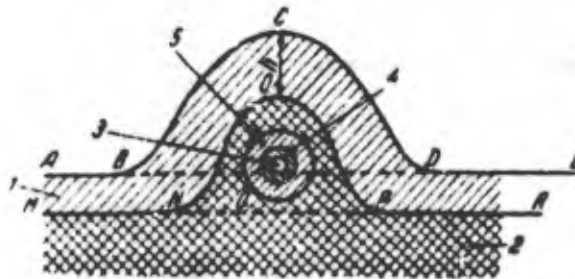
Second variant of water pipe placement. Pipe laid on the surface of the soil. 1) Active layer; 2) Permafrost; 3) Water pipe; 4) Moisture-bearing soil; 5) Insulating layer (peat).
